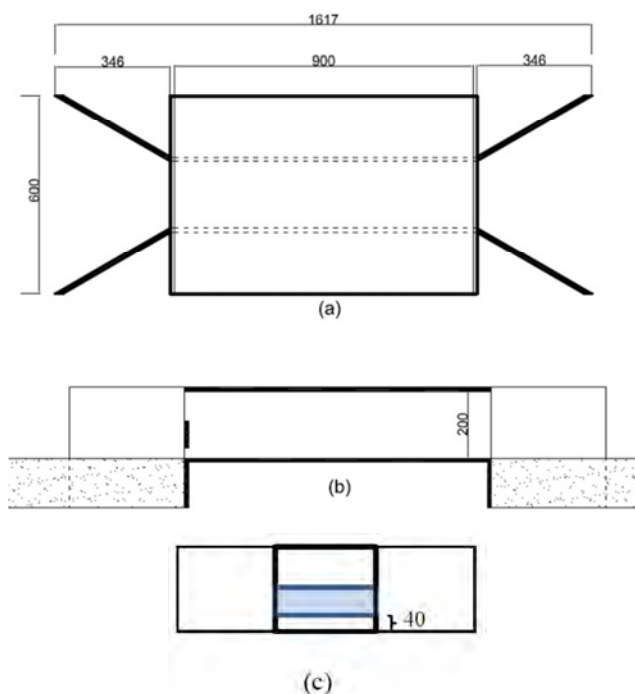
Culvert model ; (a) Plan view (b) Profile view (c) inlet view (all units are in mm)
